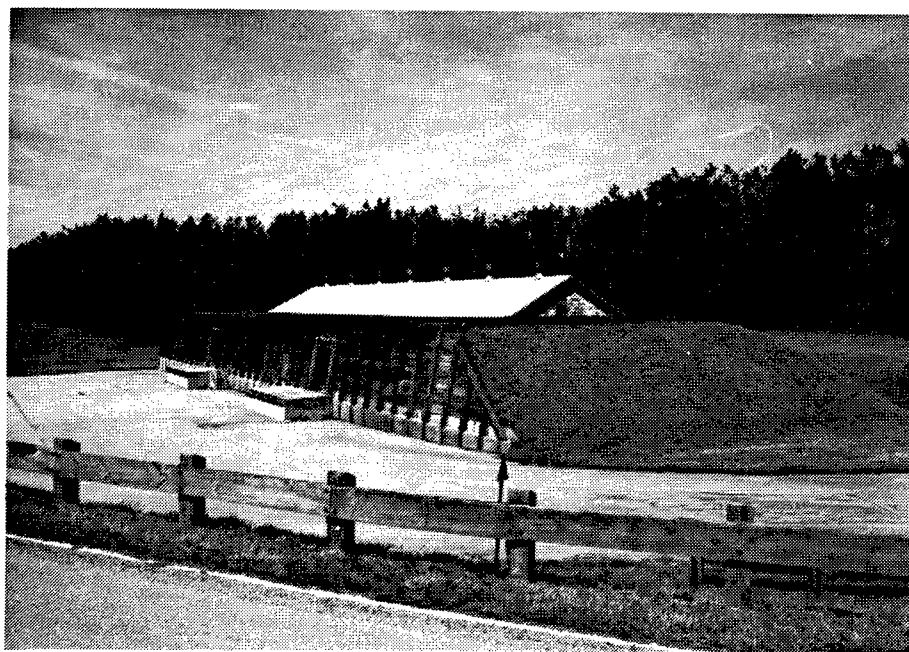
Building 1958: Smokeless Powder Magazine with earth-filled wooden barricade and three earthen-backed wooden barricades.
